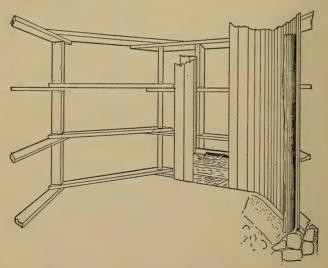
Perspective, showing construction of frame, and double lining with paper between. The door is made of two thicknesses with paper between, as shown.
